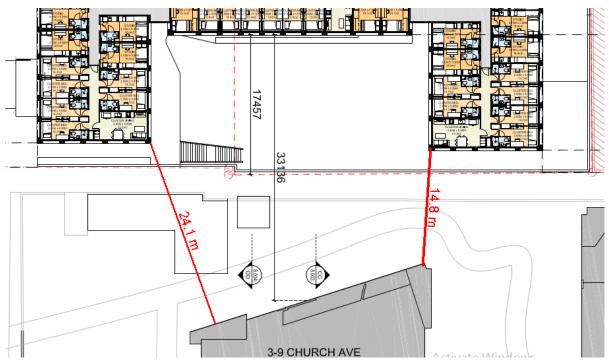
Proposed separation between subject development and 3-9 Church Avenue
